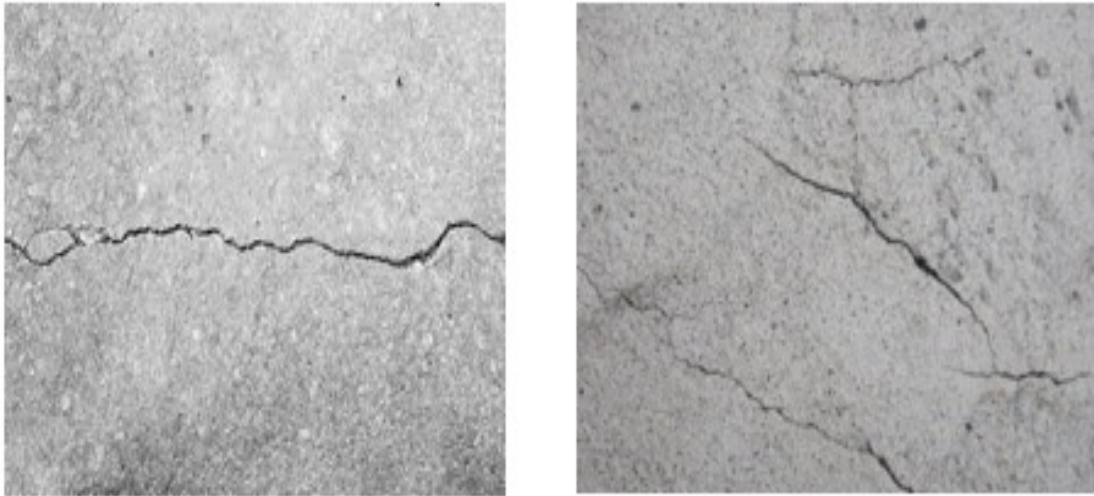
Cracking in Concrete Structures [27].
